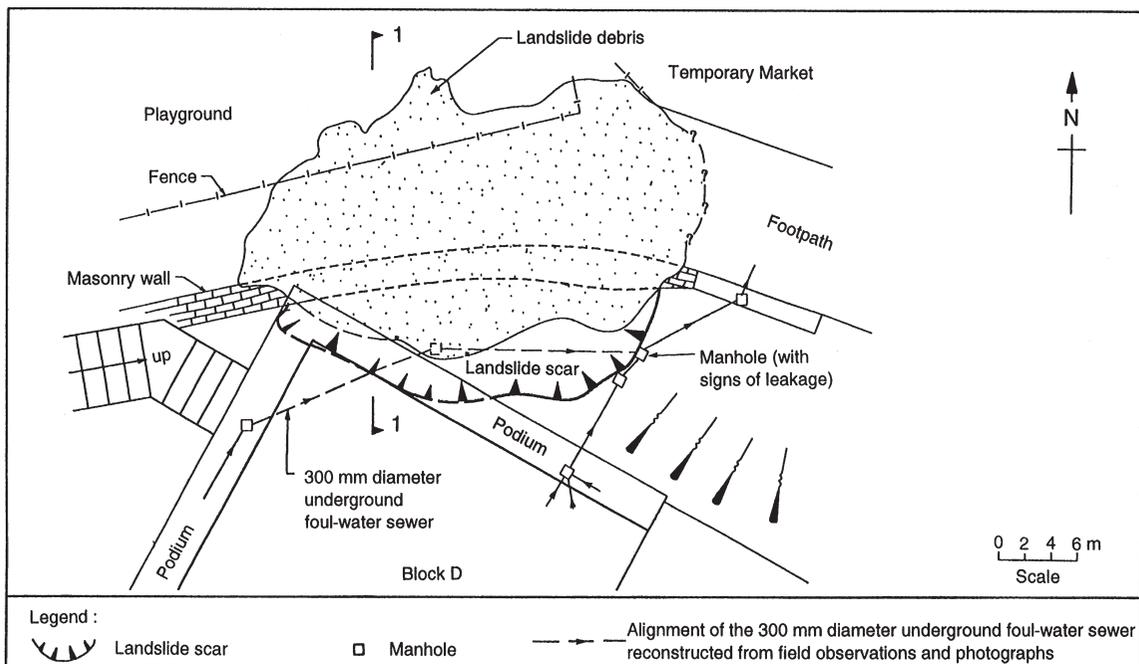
Plan of the landslide. See Figure 5 for details of section 1-1. Information in this figure is based on topographic surveys, engineering geology mapping, and field observations
